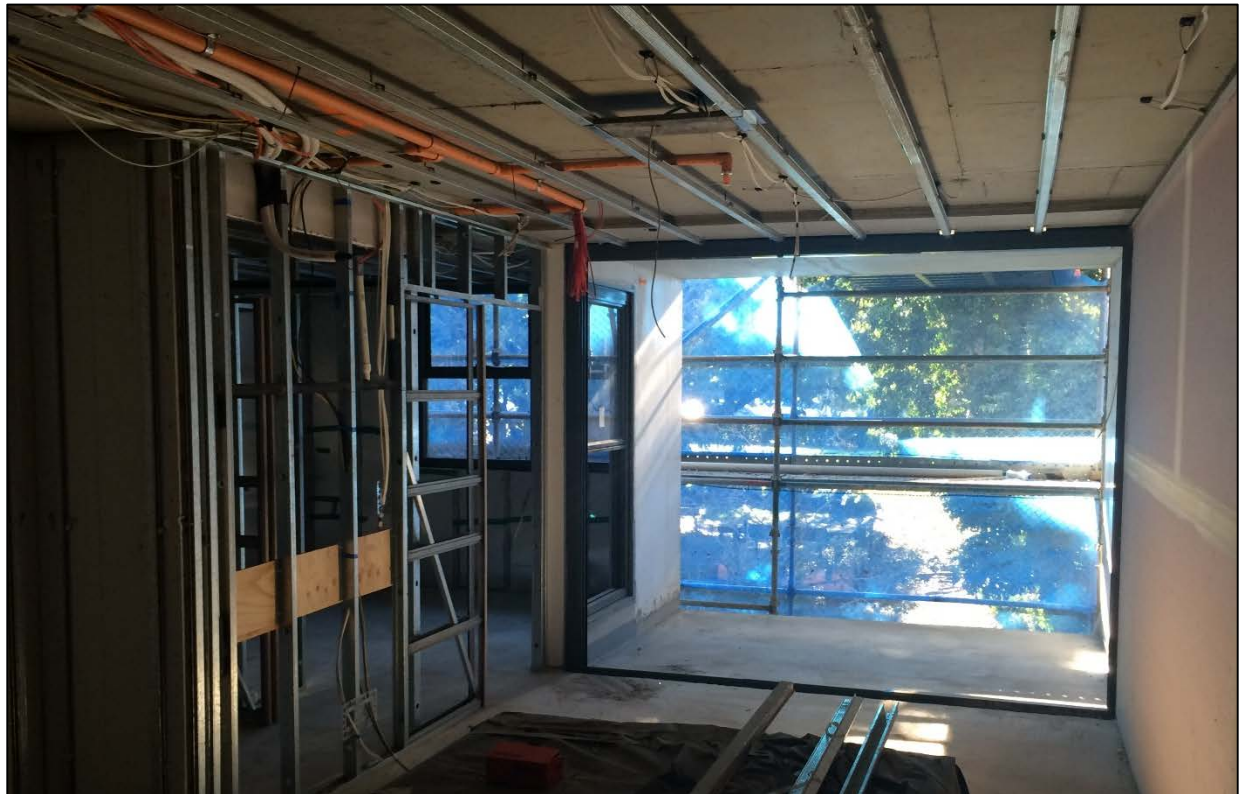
Level 2 – The prototype apartments. Door and window frames are inserted and final services are laid prior to walls being finished.
